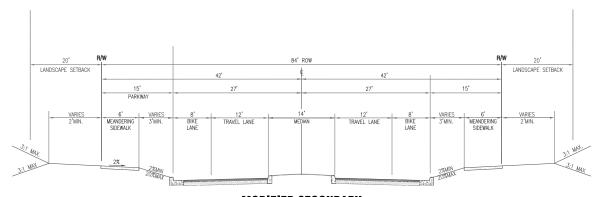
ON-SITE RECOMMENDED LANE IMPROVEMENTS
